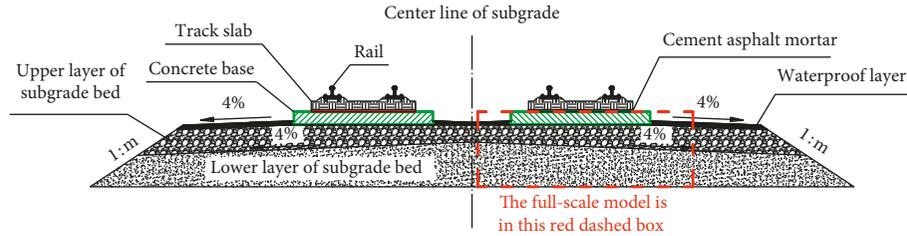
The cross section profile of the slab track-subgrade close to the expansion joint of the concrete base.
